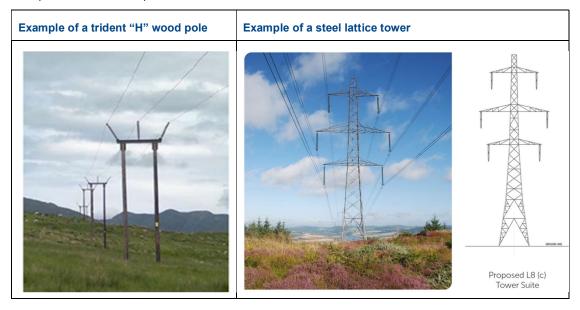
'H' Trident Wood Pole and Steel Lattice Tower examples.
